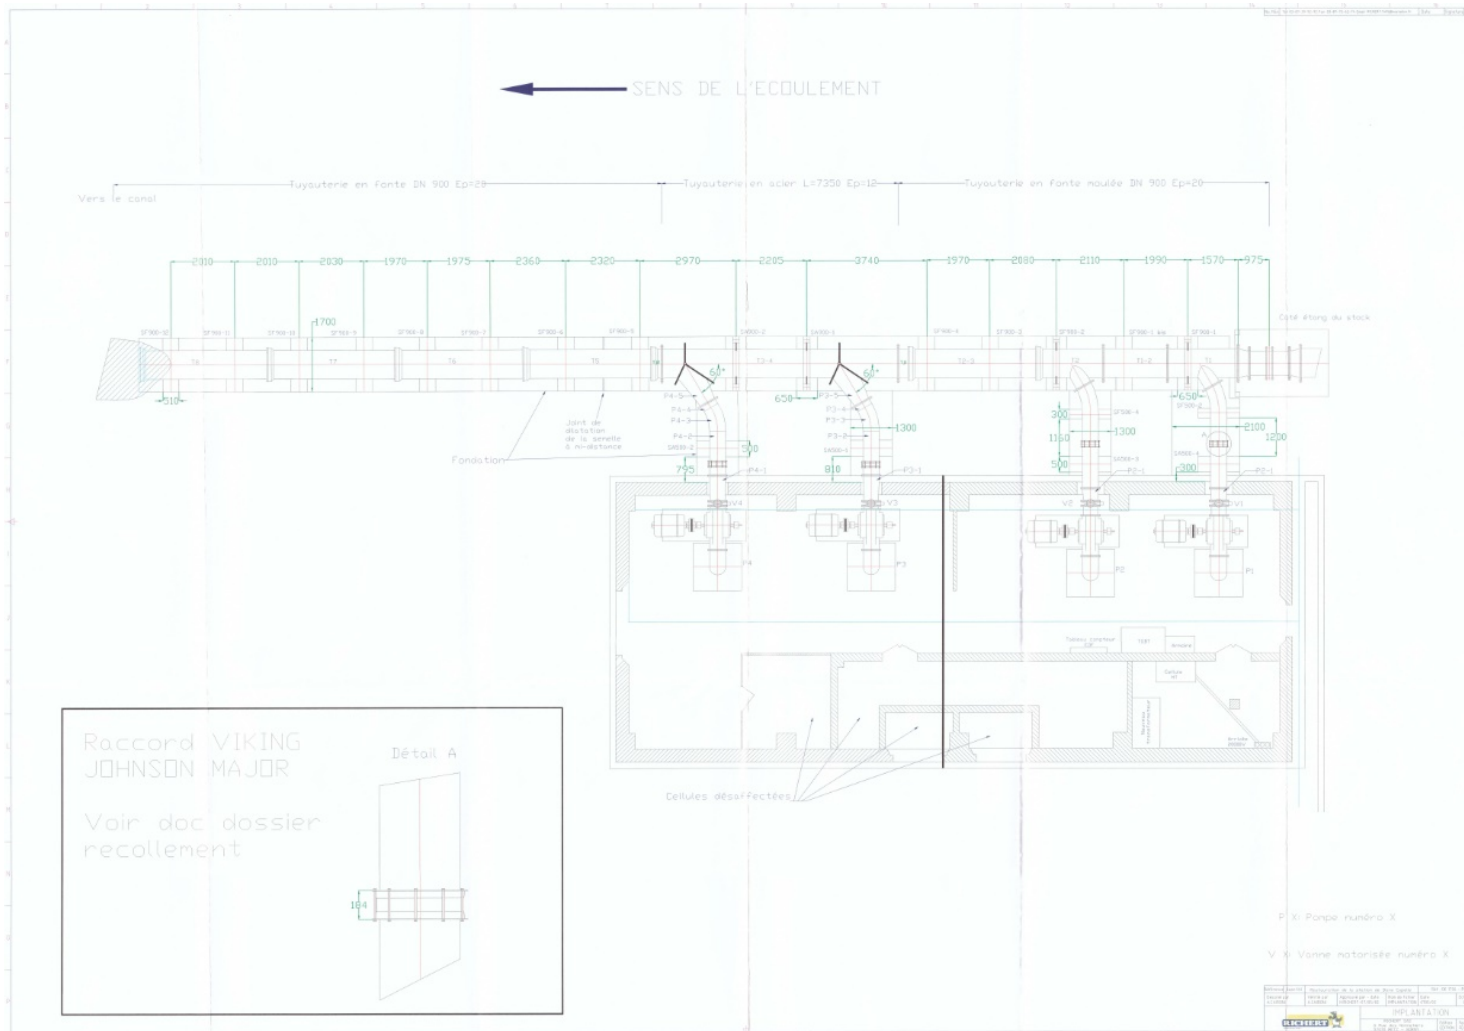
Existing Pump Arrangement (Plan) at Stock PS
